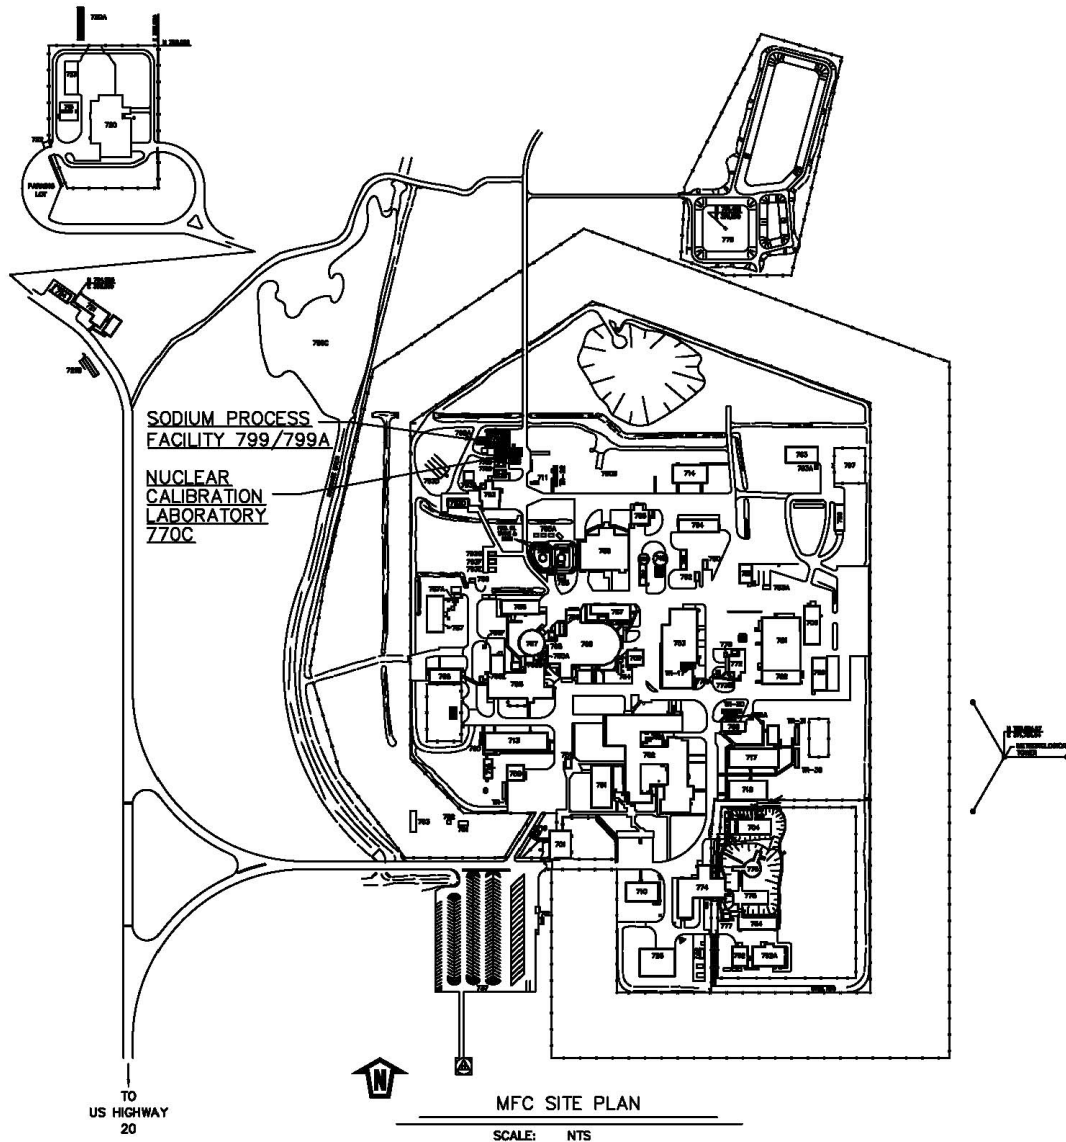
Location of facilities being transferred at the Materials and Fuels Complex.
